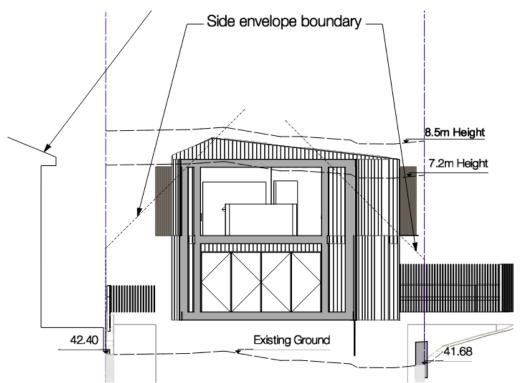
excerpt of plan section P-11 section 1 showing the 7.2m wall height and 8.5m height of buildings profile
